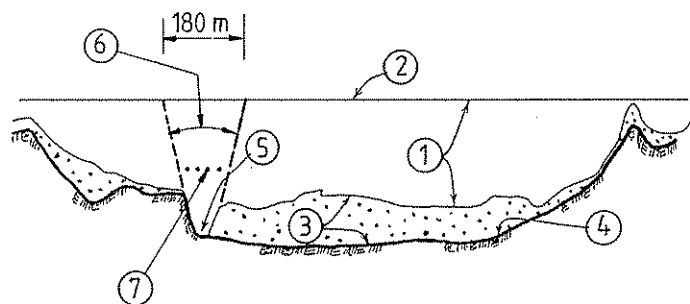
The Wister dam. Longitudinal section showing location of erosion tunnels with respect to closure section (adapted from Sherard 1973, 1986).
